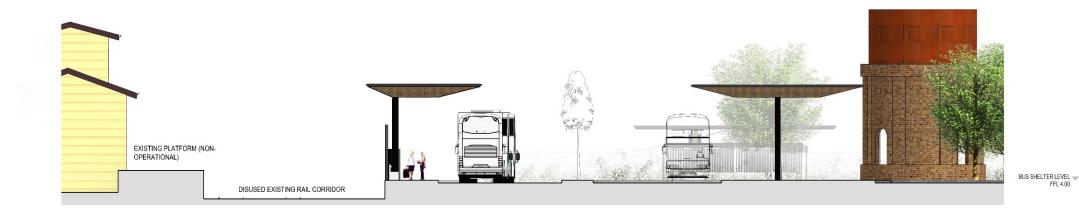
East West sectional elevation through site, (Vegetation has been shown indicatively only)
